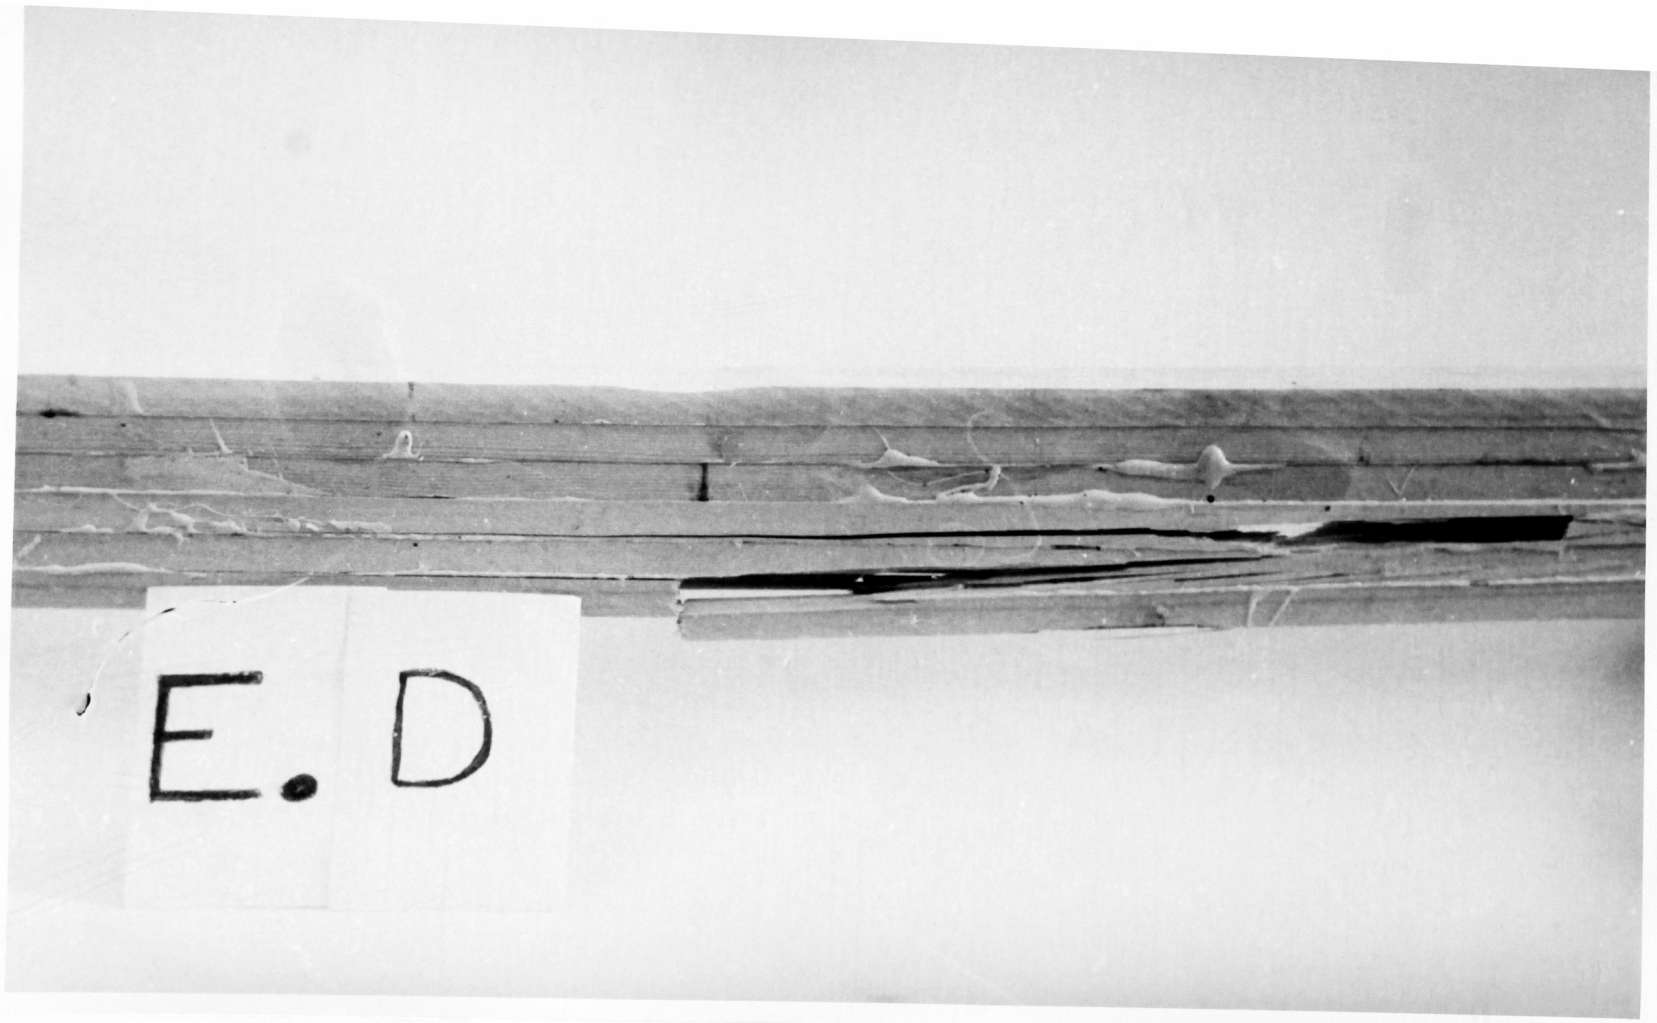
FIGURE X TYPICAL FAILURE OF THE EPOXY CONTROL BEAMS, TYPE D
